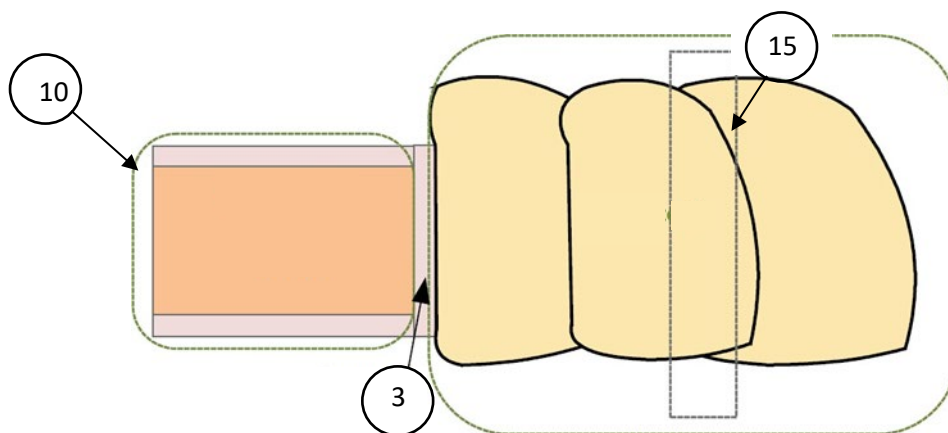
Pillows fitted to an opening in a massive timber wall – Plan view
